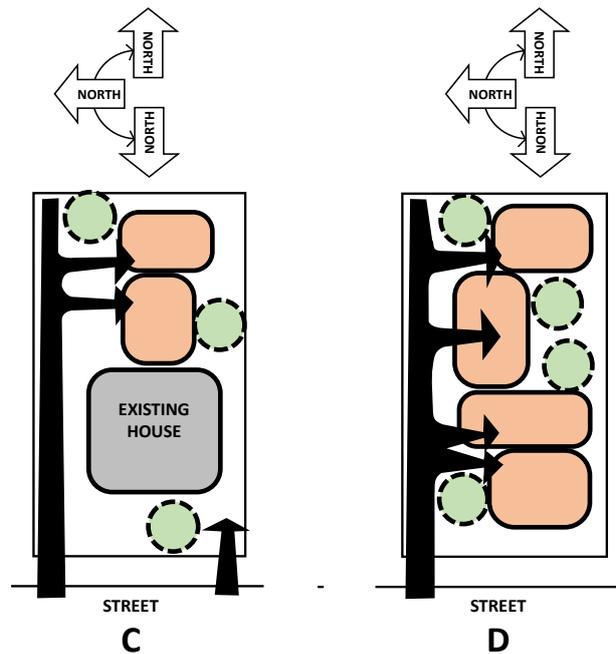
Possible ways to organise dwellings and private open spaces on a site where access on the optimum side is not possible.
